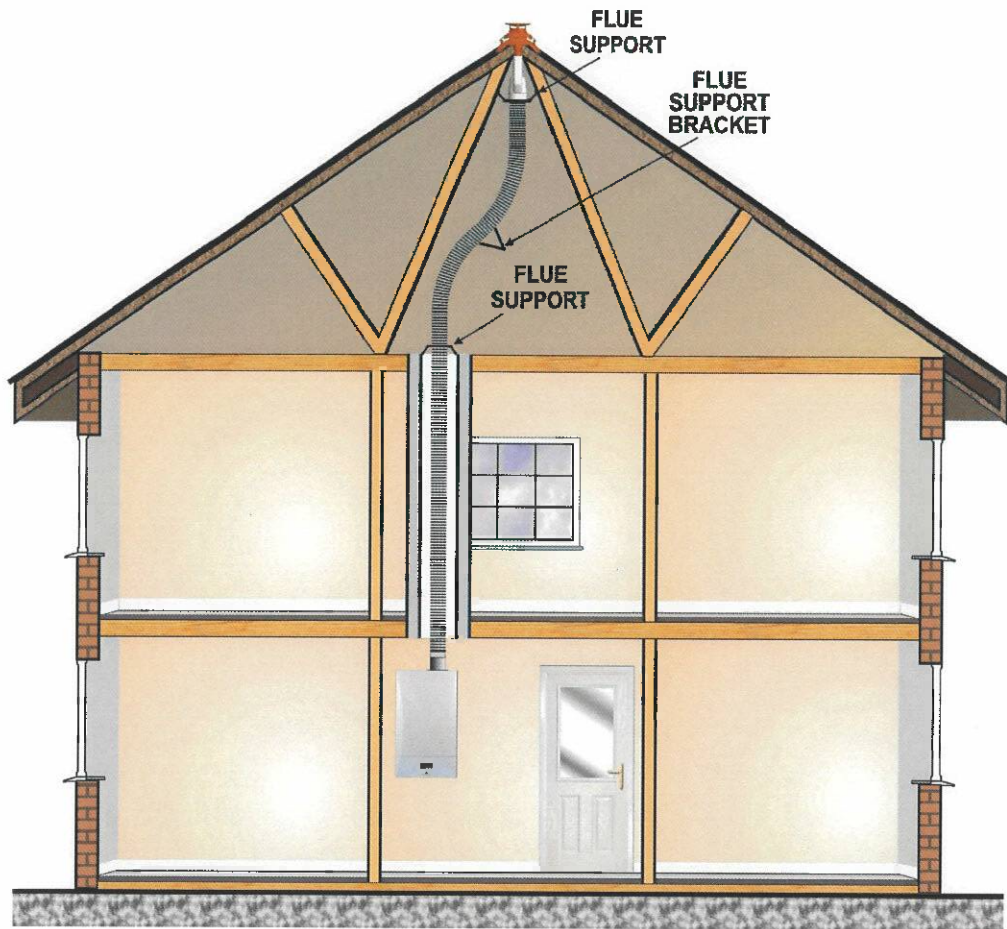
Fully flexible chimney system from boiler to a roof space. Check manufacturer's literature to see if this installation arrangement is approved.
